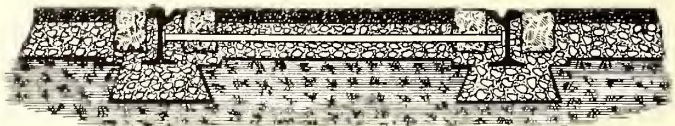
GIRDER RAIL, ON CONCRETE GIRDER CONSTRUCTION
